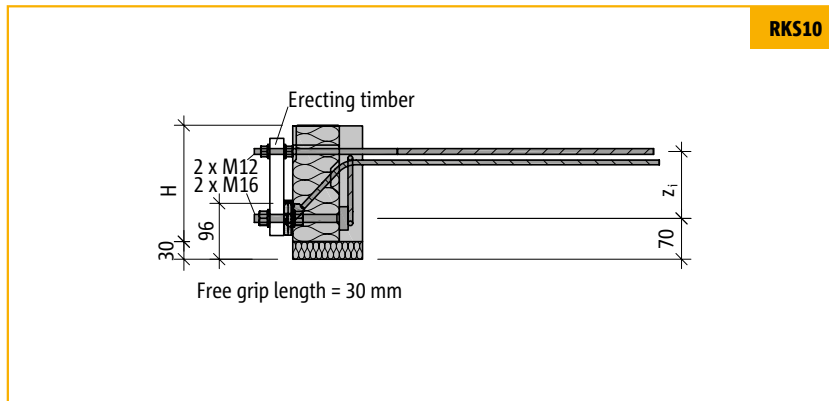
Side elevation: Schöck Isokorb® type RKS10
